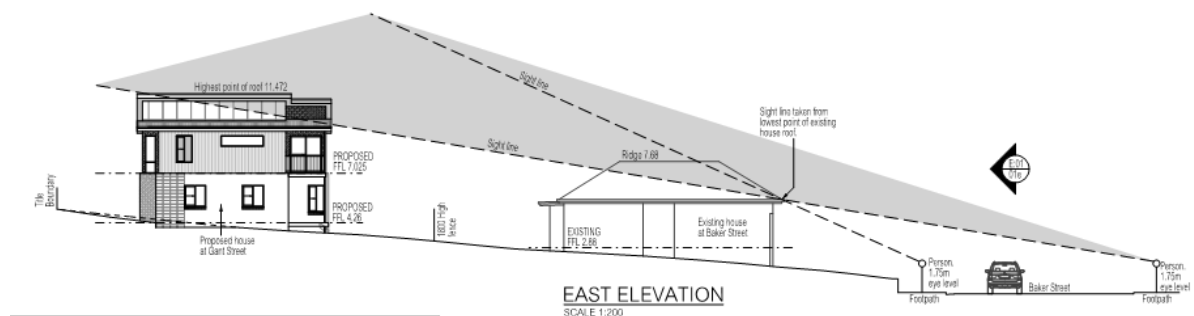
Excerpt from plan o1e/03 submitted (5 April 2016).
